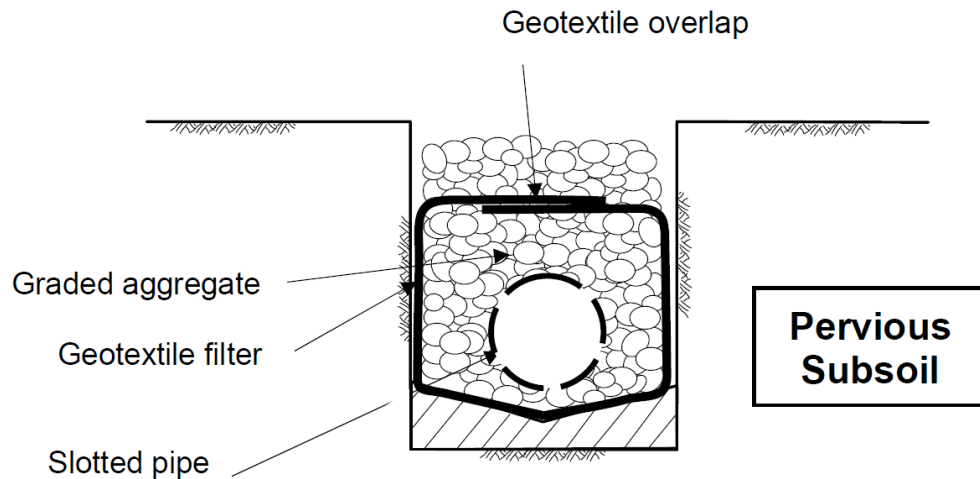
Cross-section of a typical subsoil drain used in pervious soil (for example, sandy soil)
